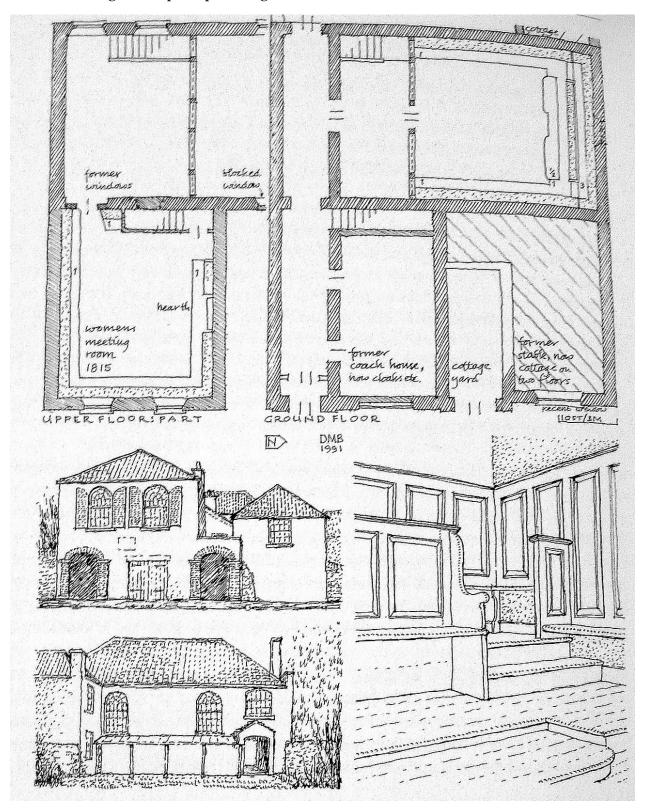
Plan, internal and external elevations, from Butler, Vol. 2, 1999, p. 216 (surveyed in 1970)
